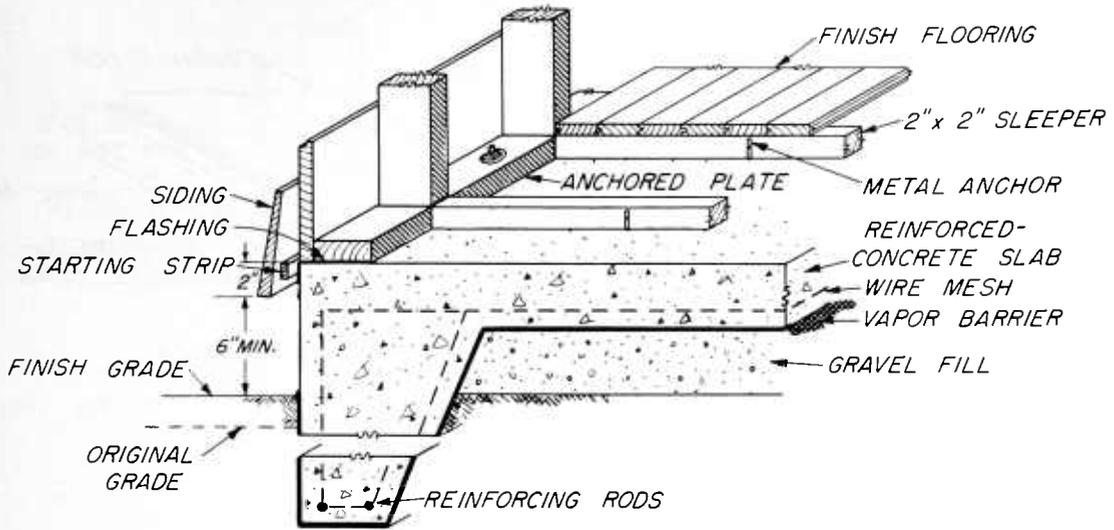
Combined slab and foundation. The gravel fill should be of a size that will be retained on a 1-inch mesh screen.
